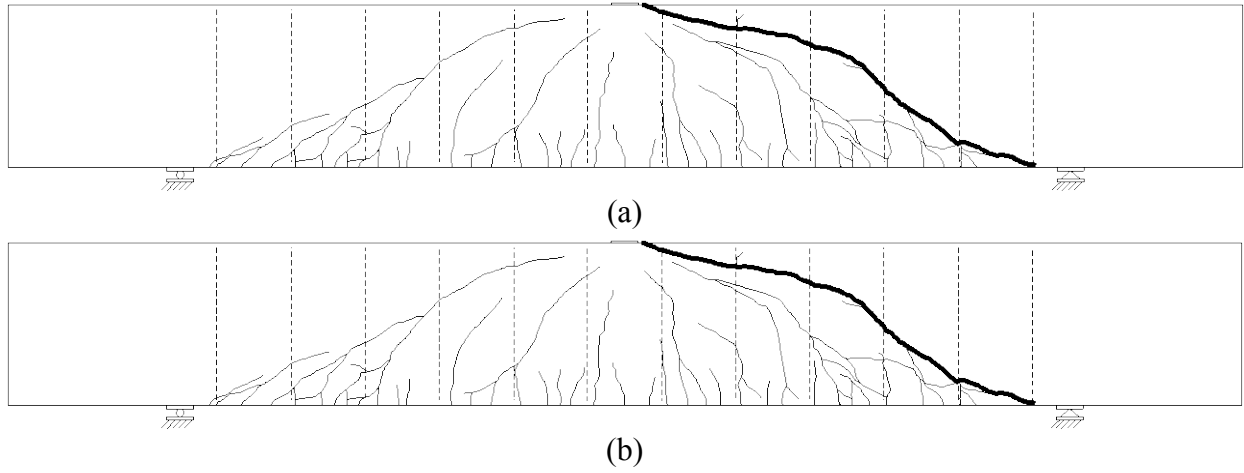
Observed damage in specimen P2S5, (a) front side, (b) back side
